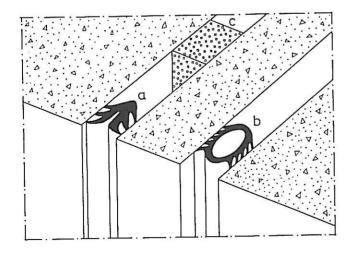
Gaskets mounted into joints. a) gasket forced into the joint, b) vacuum tube, c) gasket of precompressed open-cell sponge
